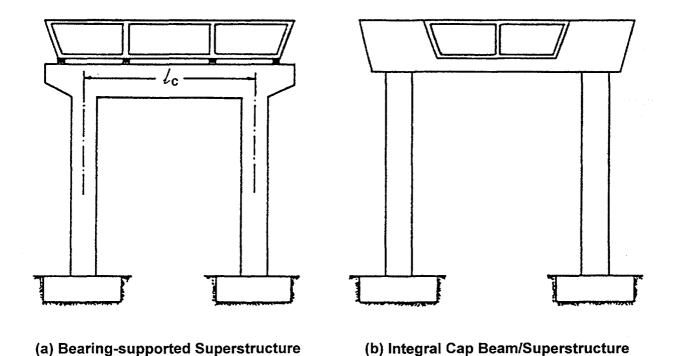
Typical cap beam-to-superstructure connections (from ref. 18).
